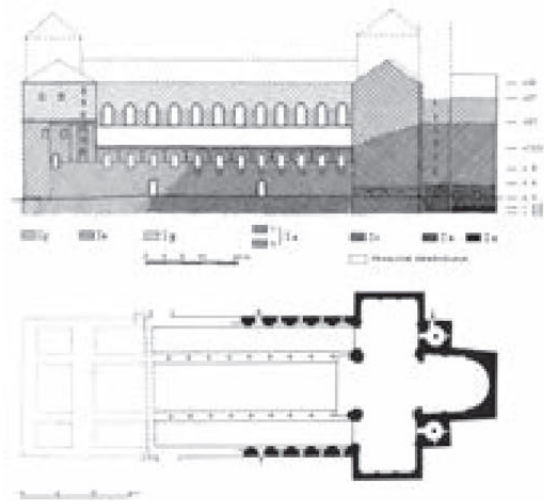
Speyer Cathedral, building phases c. 1025-70 (reconstruction Hans Erich KUBACH & Walter HAAS)
